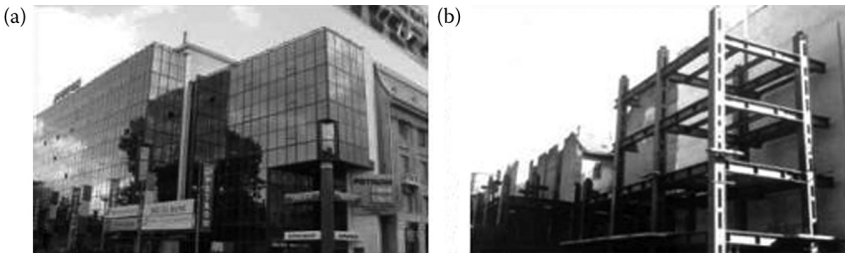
City Bank Building in Timisoara, Romania: (a) facade; (b) steel structure under erection.
